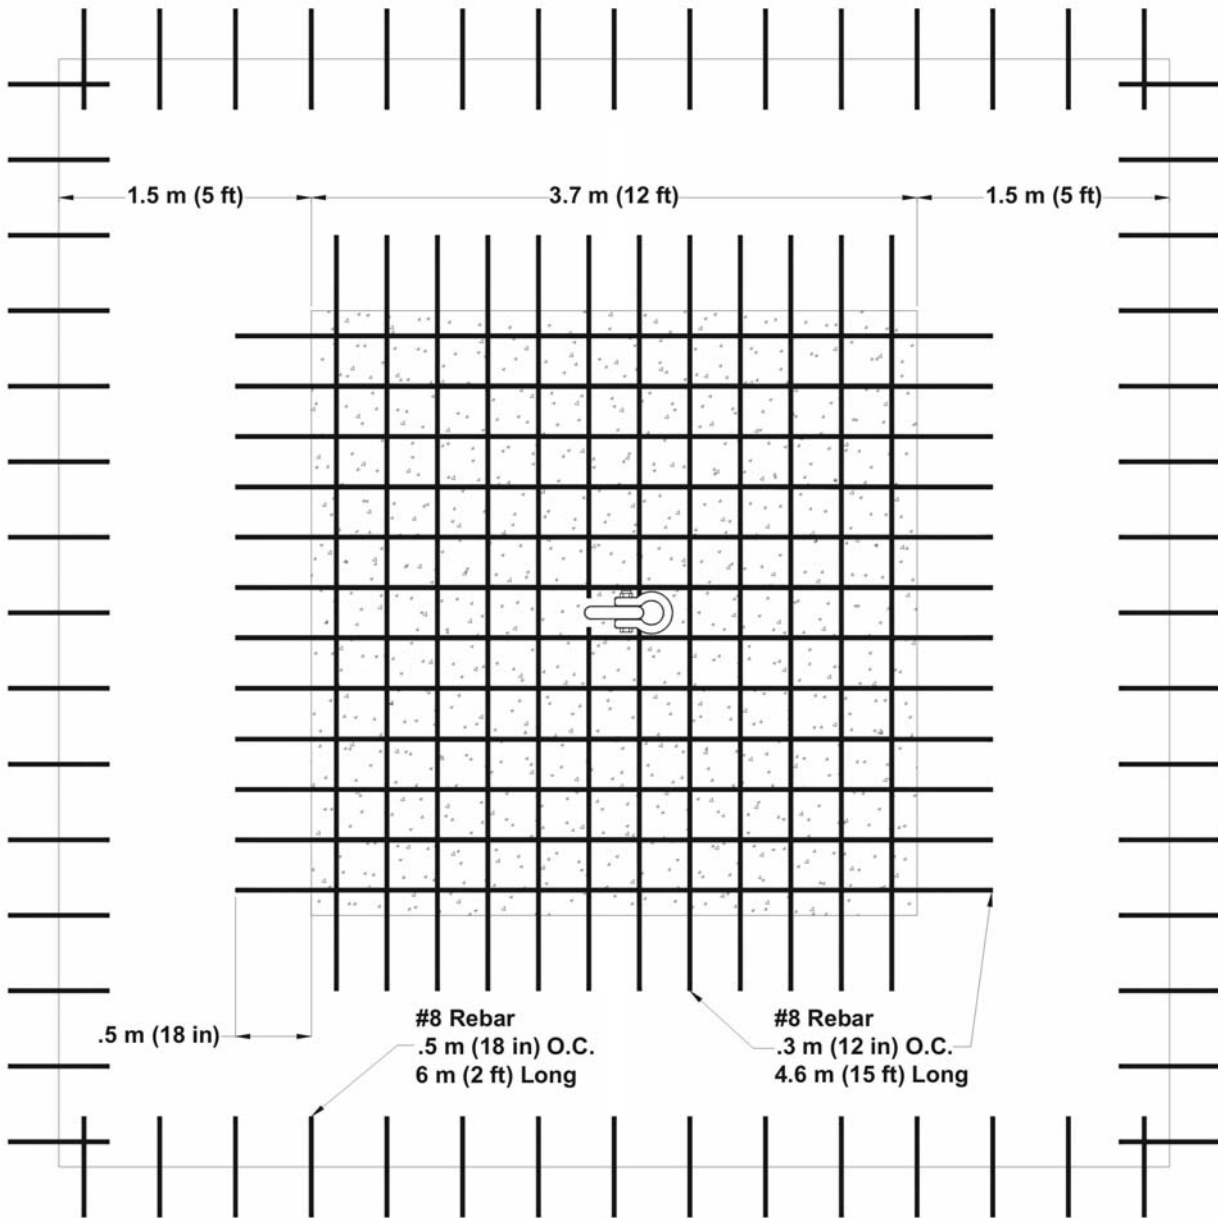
Standard 445 kN (100,000 lb) Thrust Concrete Block - Plan View
